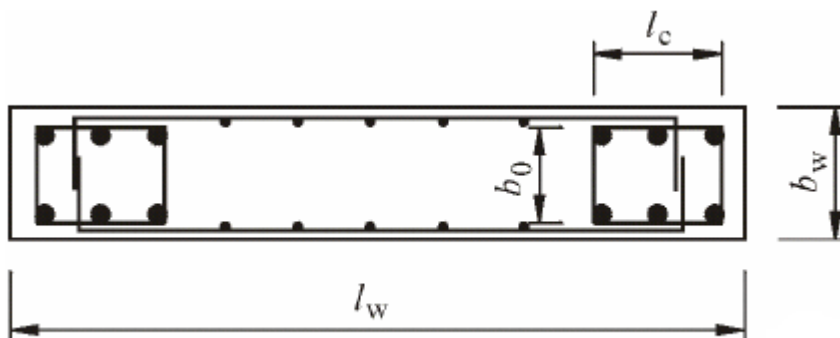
Boundary elements in wall section (SANS 10160-4, 2017, Annex C)
